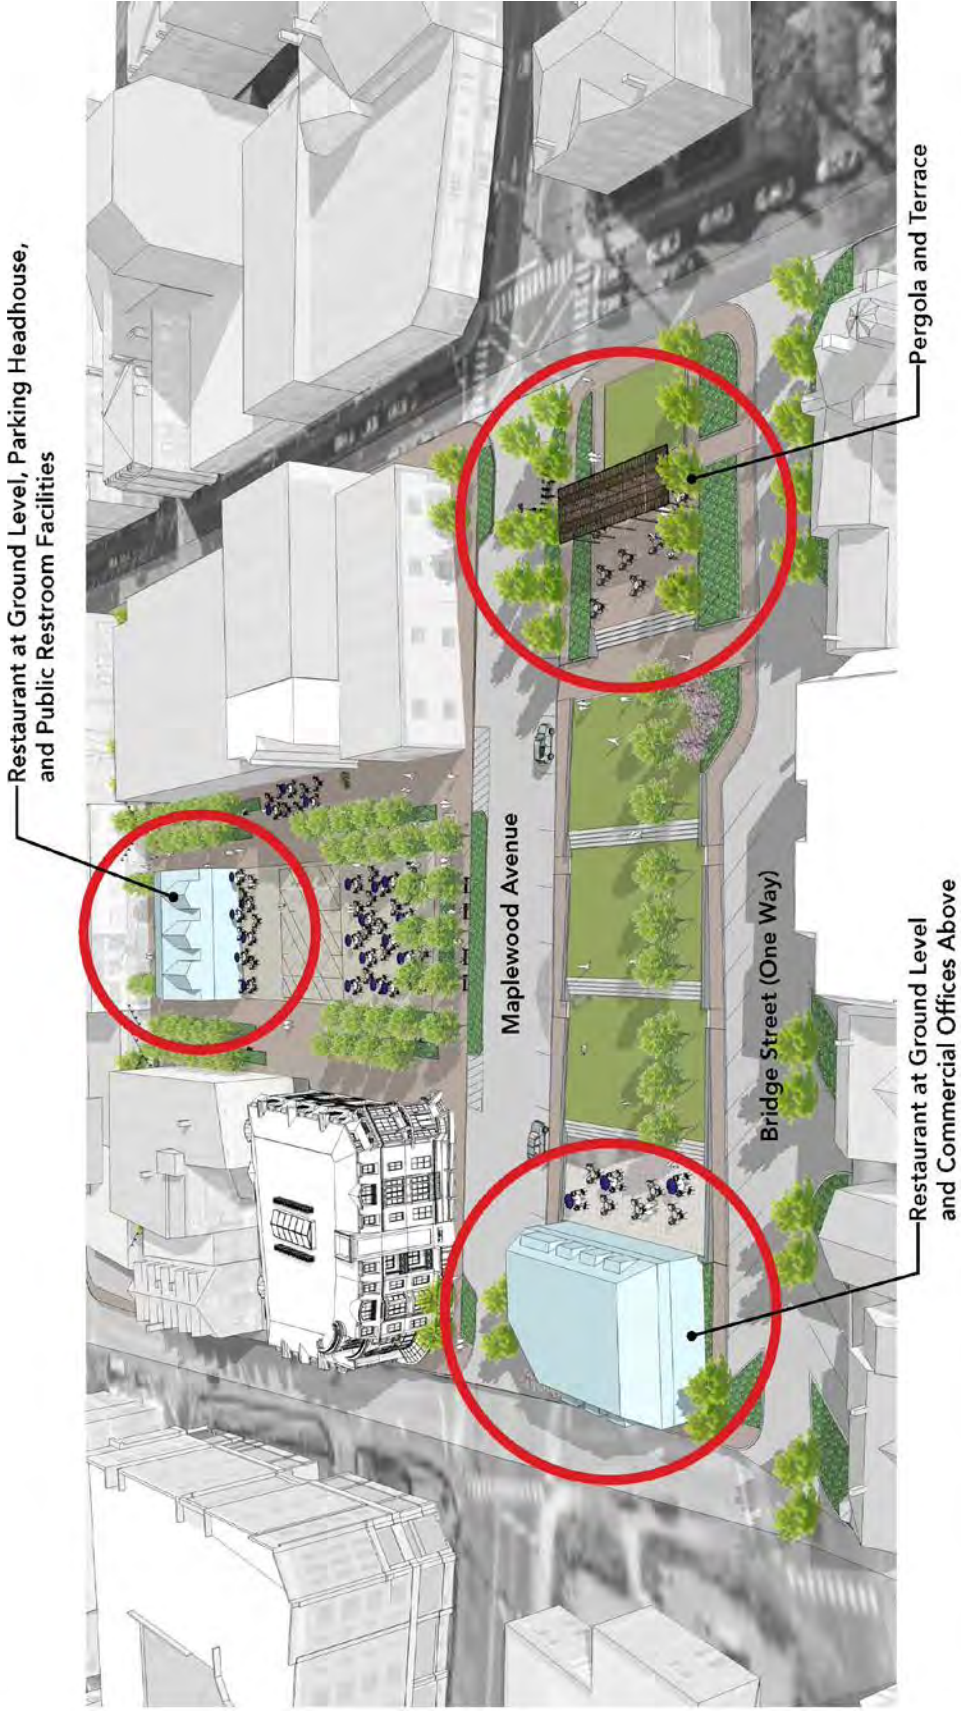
The Vision includes integrating civic building types located to optimally activate and engage the civic open space on Bridge & Worth Lots and Vaughan Mall. The open air pergola is an invitation to the Bridge Lot Open space and is set back from Islington Street in deference to the architecture of the Academy (Discover Portsmouth) building. The Civic Buildings provide ground floor restaurant opportunities and public amenity program to activate and energize the open spaces year round.
